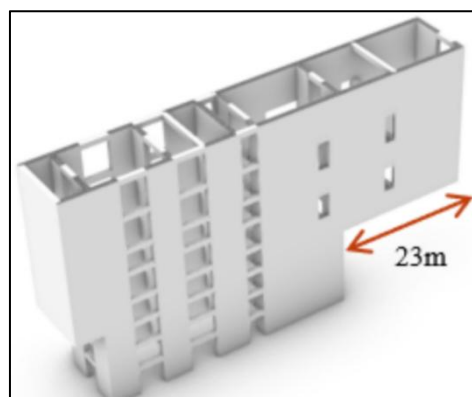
Schematic Diagram of a Large-span Multi-story Reinforced Cantilever Wall
